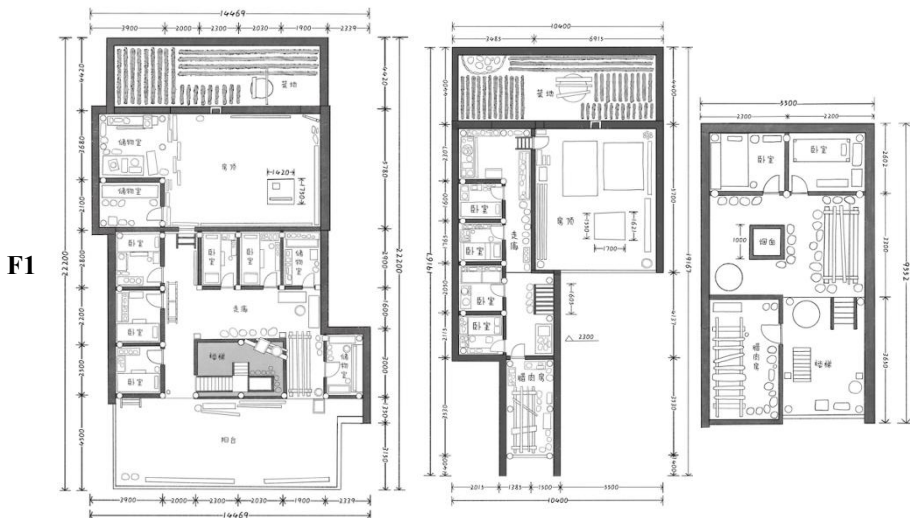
Selected On-Site Hand-Drawn Floor Plans
